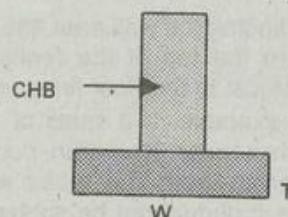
CROSS SECTION OF CHB FOOTING
